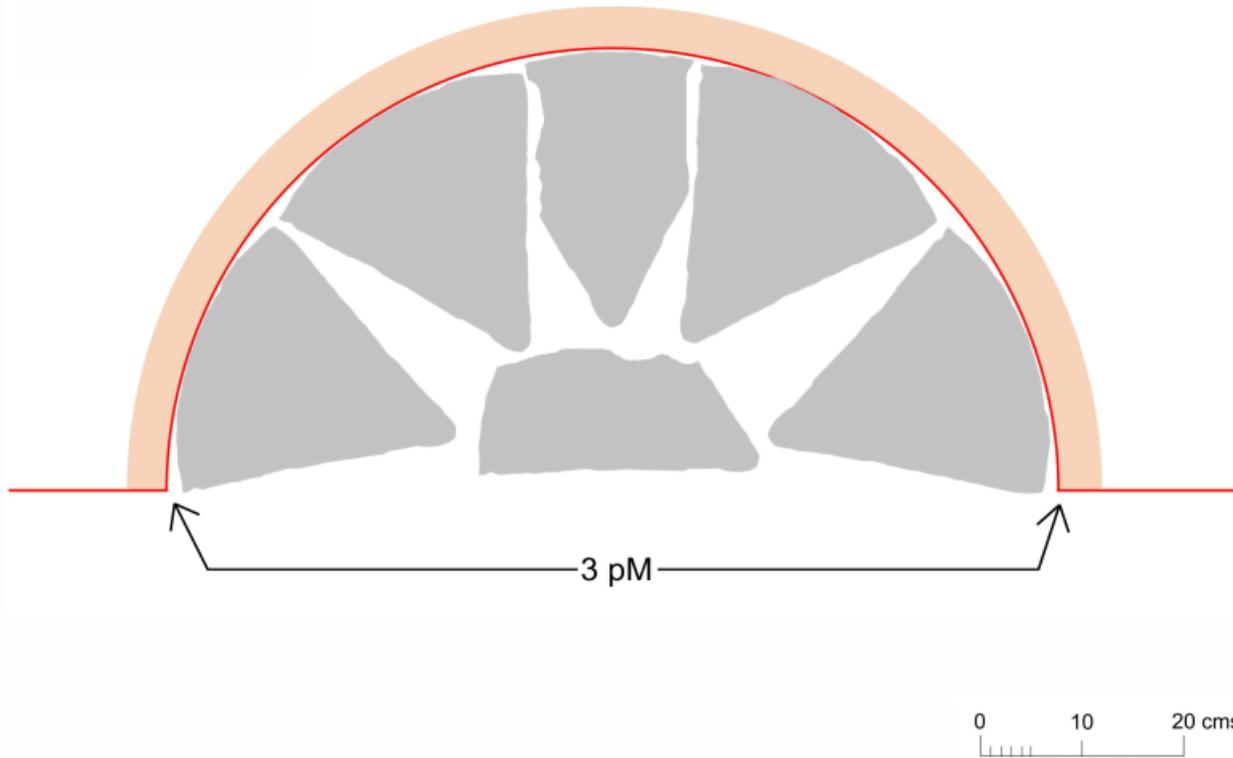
Reconstruction of the attached column F8 with brick fragments.
